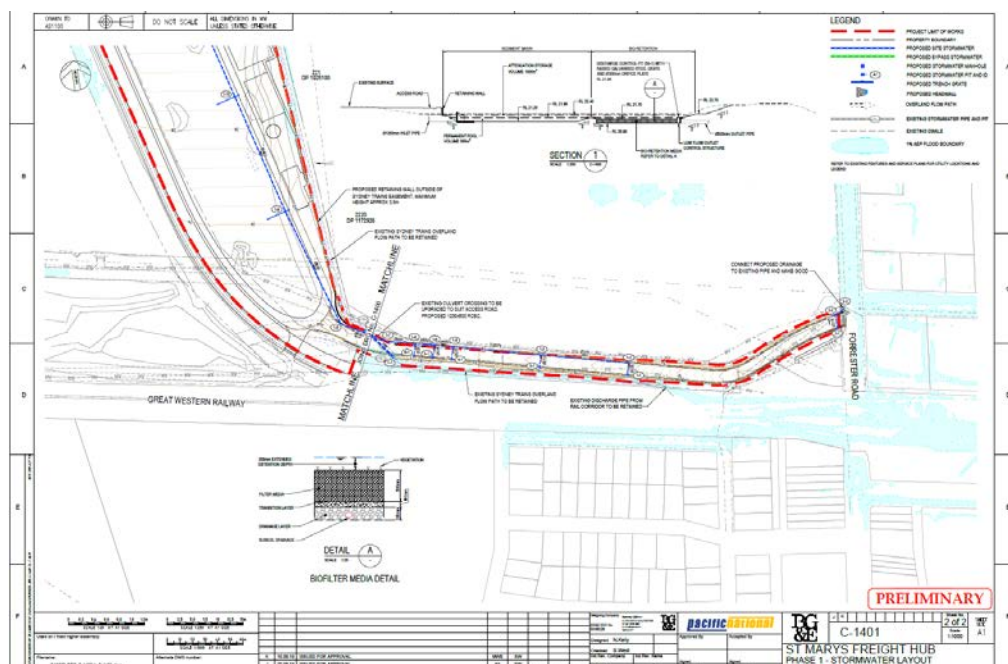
| Applicant's revised stormwater layout – Sheet 2 (Source: Applicant's RtS)
